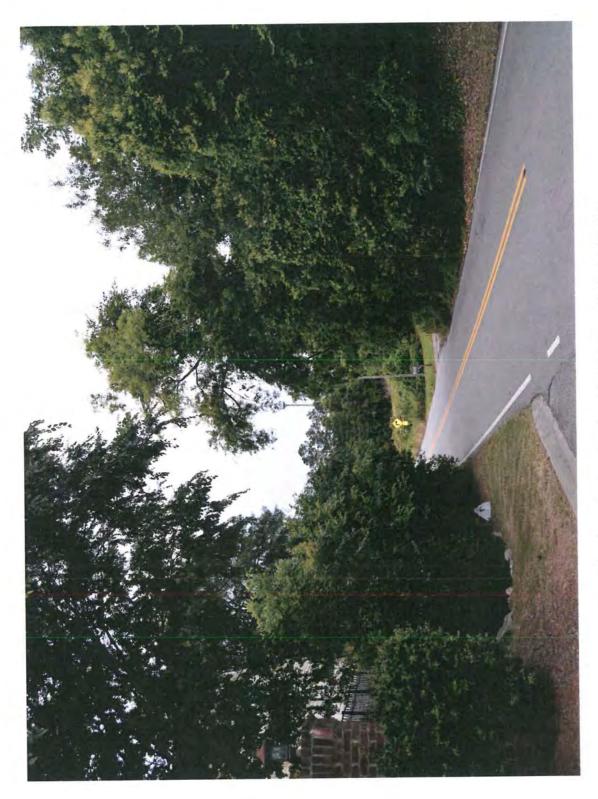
Intersection of Lucius Road & Canal Pl Way (N 34° 01' 10.09", W 81° 03' 22.77")
